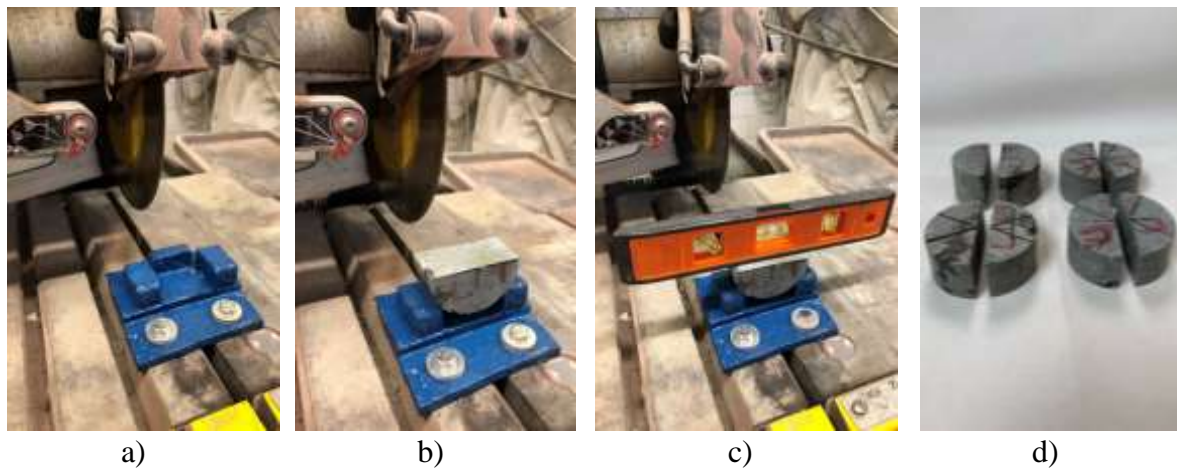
Sample preparation for fracture toughness testing: a) custom-made jig; b) creating notch length in disc; c) sample positioning, and d) notched semi-circular bend samples.
